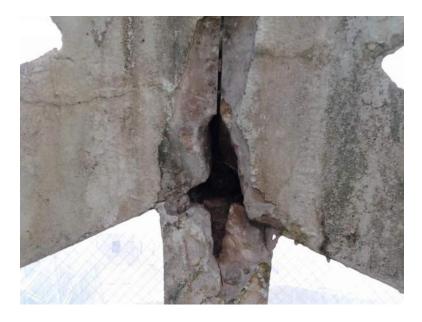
REMOVAL OF GROUT MAKES ROOM FOR NEW GROUT REPAIR
